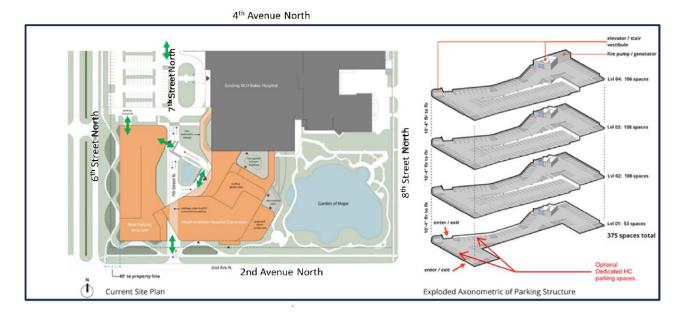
Site Plan Detail(orange) of Garage(left) and Proposed Hospital Expansion(right), as well as exploded garage levels (far right).
